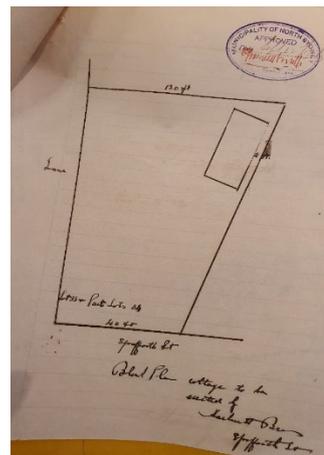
89: Block plan submitted with the application for No. 19 Glenferrie Avenue.
